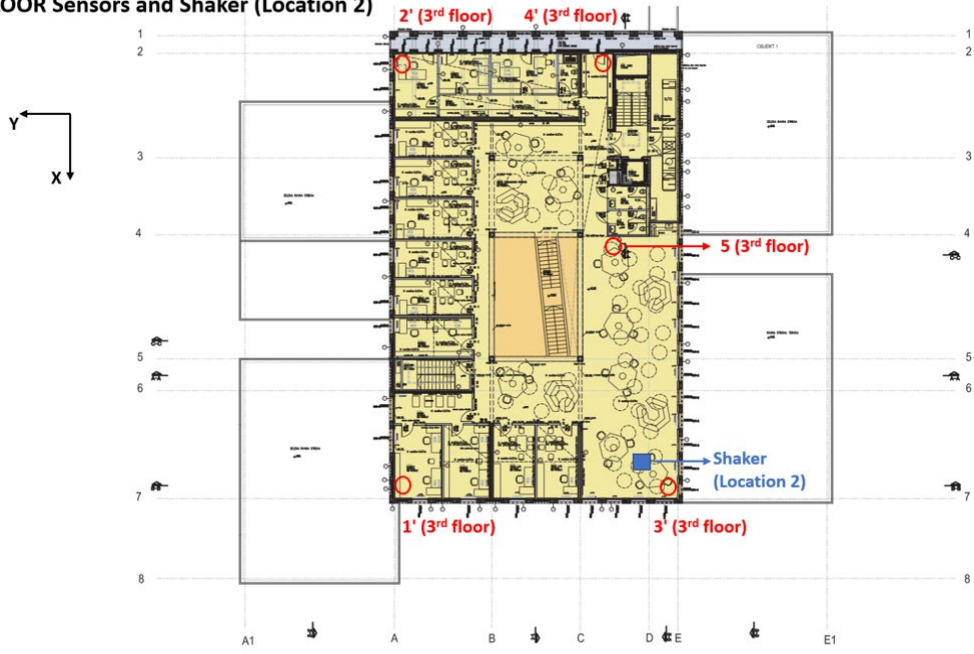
Location of 3<sup>rd</sup> floor sensors and shaker.
